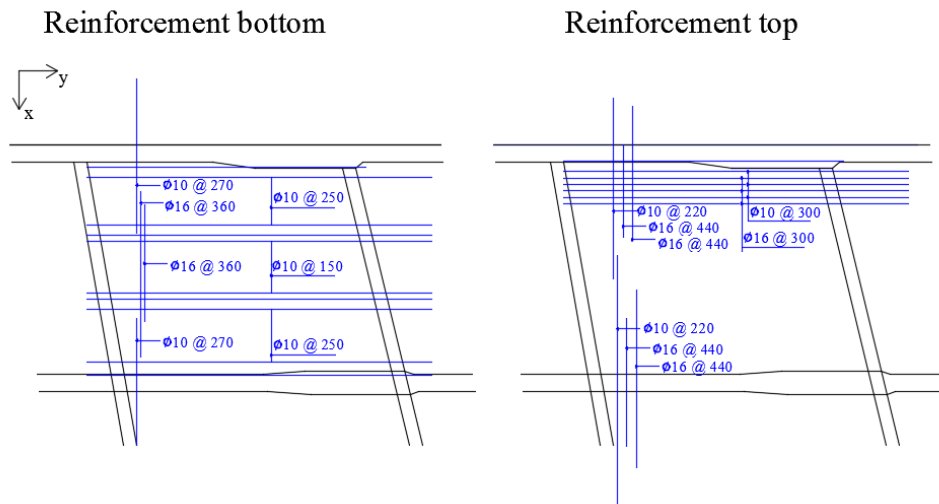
Bottom reinforcement layer (left) and top reinforcement layer (right).
